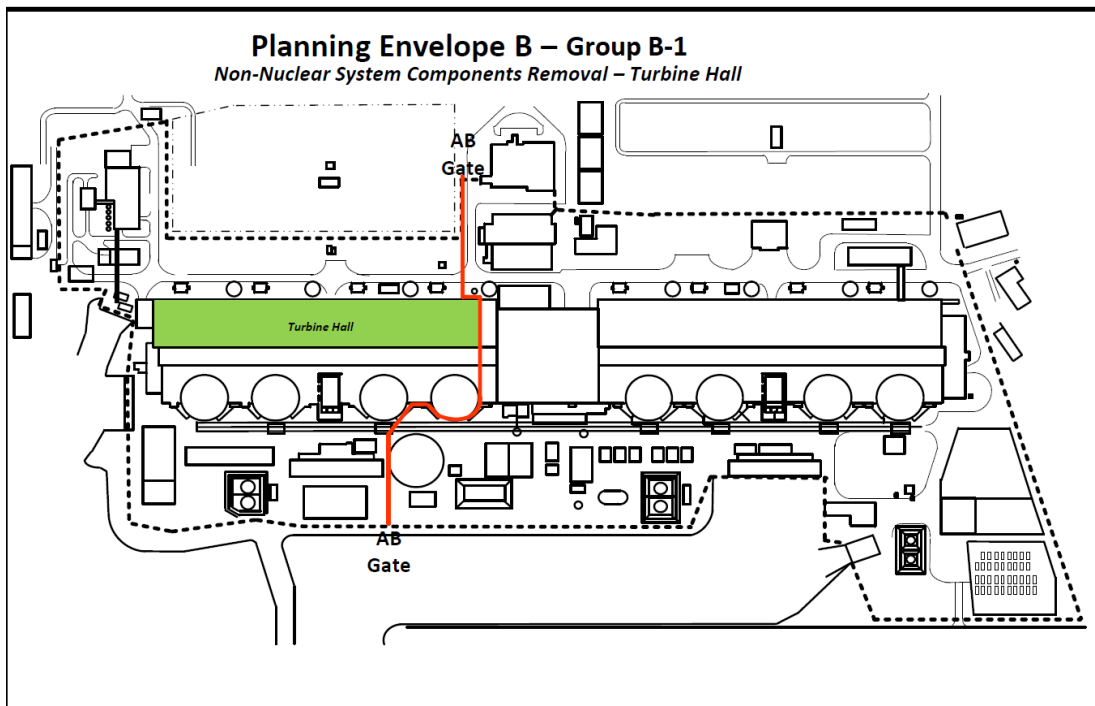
Planning Envelope B-1 – Turbine Hall
